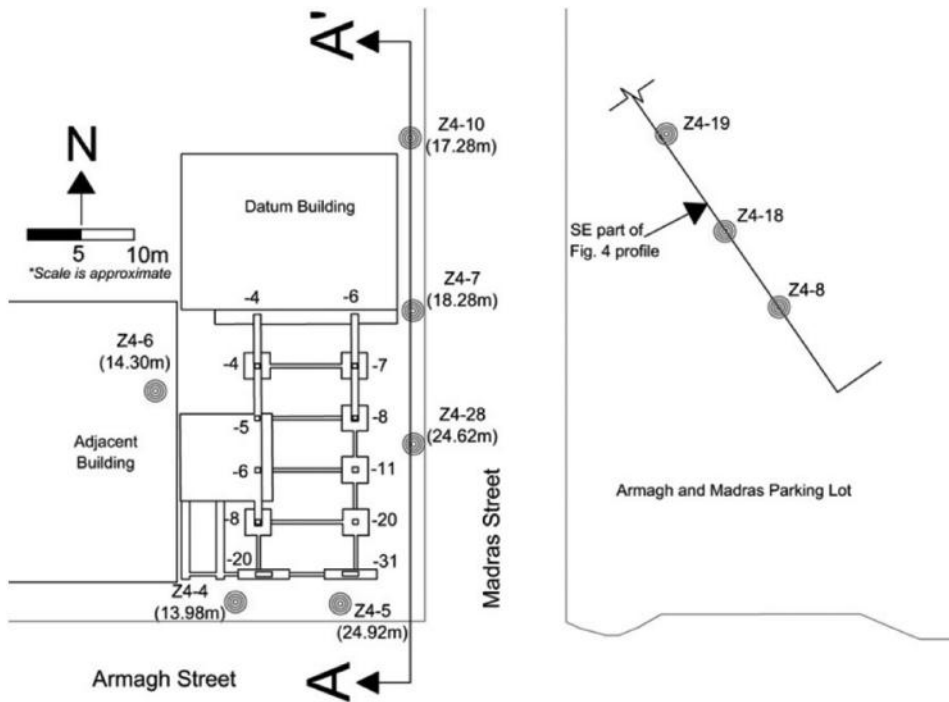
CTUC Building site with its foundation system and CPT locations (with depths). Footing settlements at column locations relative to the datum building are provided in cm. The location of the subsurface profile presented in Figure 4, along with a portion of the profile, are shown for reference.
